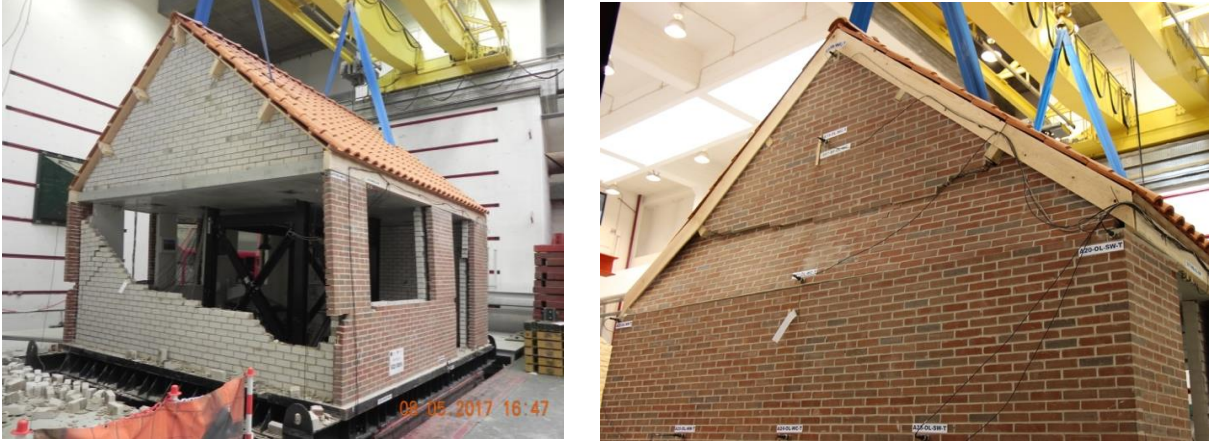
LNEC-BUILD1: damaged specimen at end of testing (Tomassetti et al., 2017)
